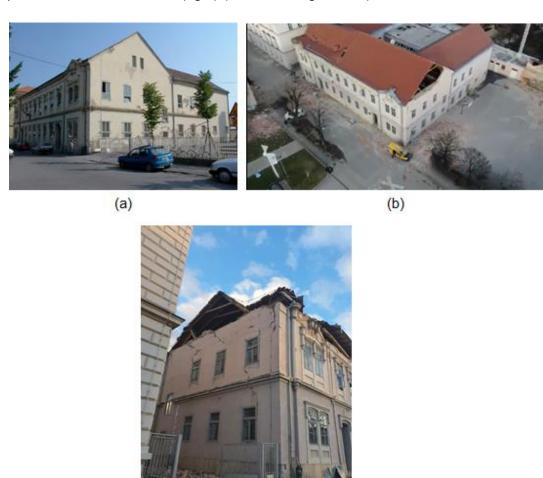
Exterior damage to the Primary School in Petrinja: exterior view (a) before and (b) after the earthquake, and (c) damage to the timber-framed roof, where masonry from the gable fell to the street (sources: (a) Google Earth; (b) Twitter 2021a and c) Nenad Bijelić).
